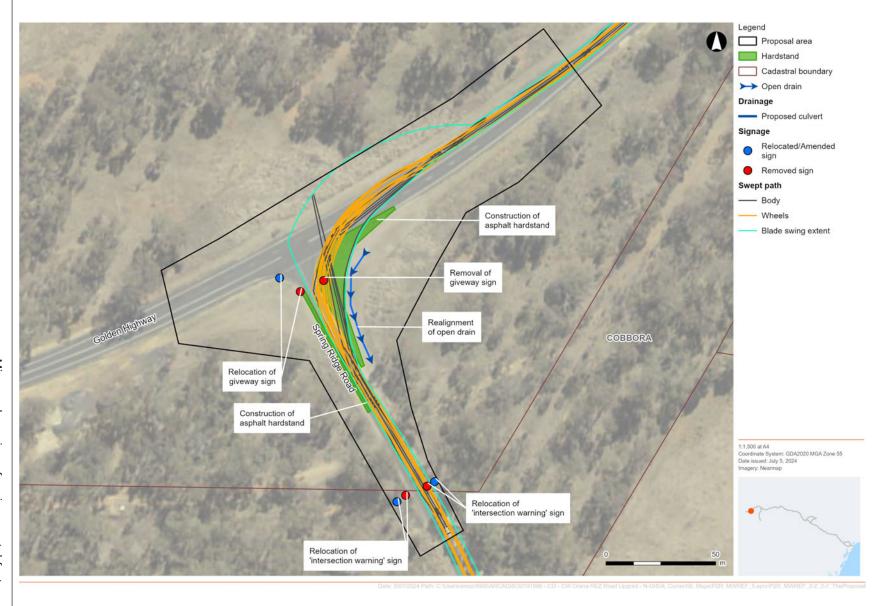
The proposal – Golden Highway and Spring Ridge Road intersection (I-015), Cobbora
